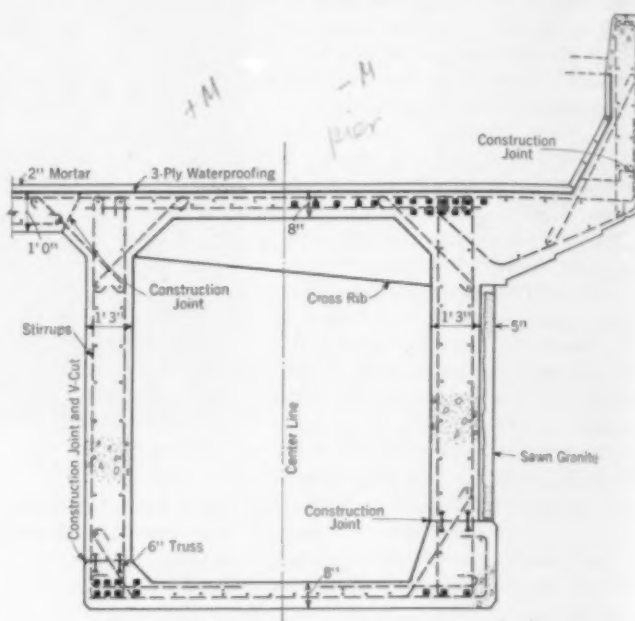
ARRANGEMENT OF REINFORCEMENT
